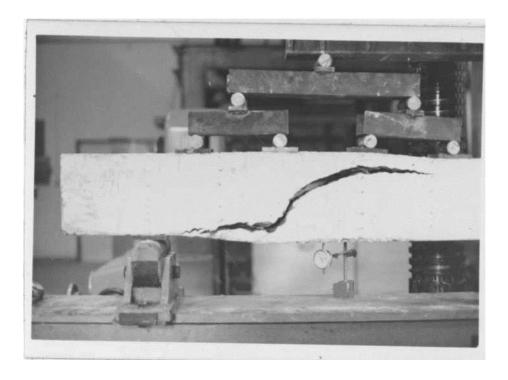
Close-up €t failure diagonal crack of beam G3/1
